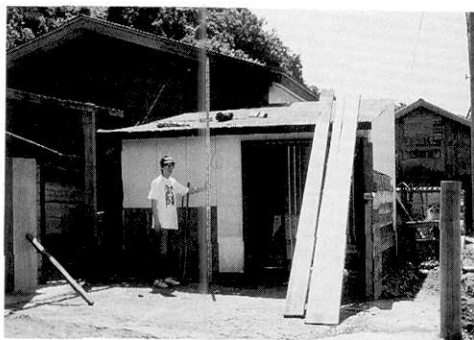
A barn of Mr. Horii's house. Several pieces of timbers were carried on the roof by sea wave and the plate of the roof partially broken, which shows that sea water climbed up to that level (8.6 meters above mean sea).
